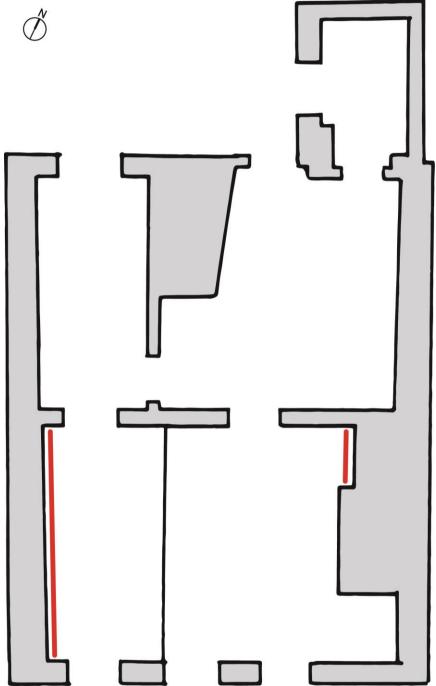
Sketch plan of first floor. The red lines indicate the position of the surviving wallpaper.
